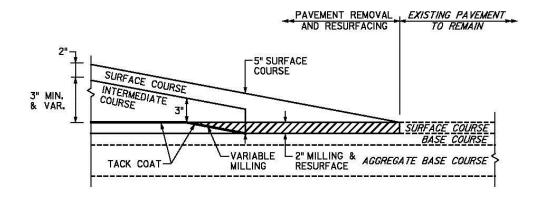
25: PARKWAY PAVEMENT REMOVAL & RECONSTRUCTION DETAIL
